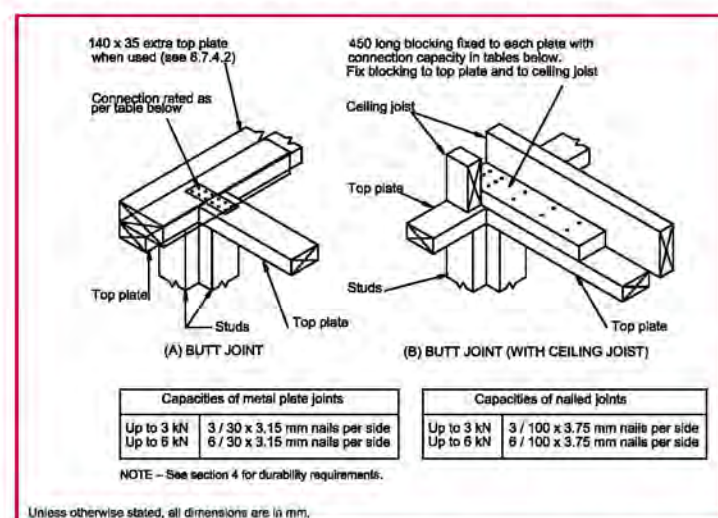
Connecting top plates to external walls at right angles – Walls containing bracing (see 8.7.3.4)
